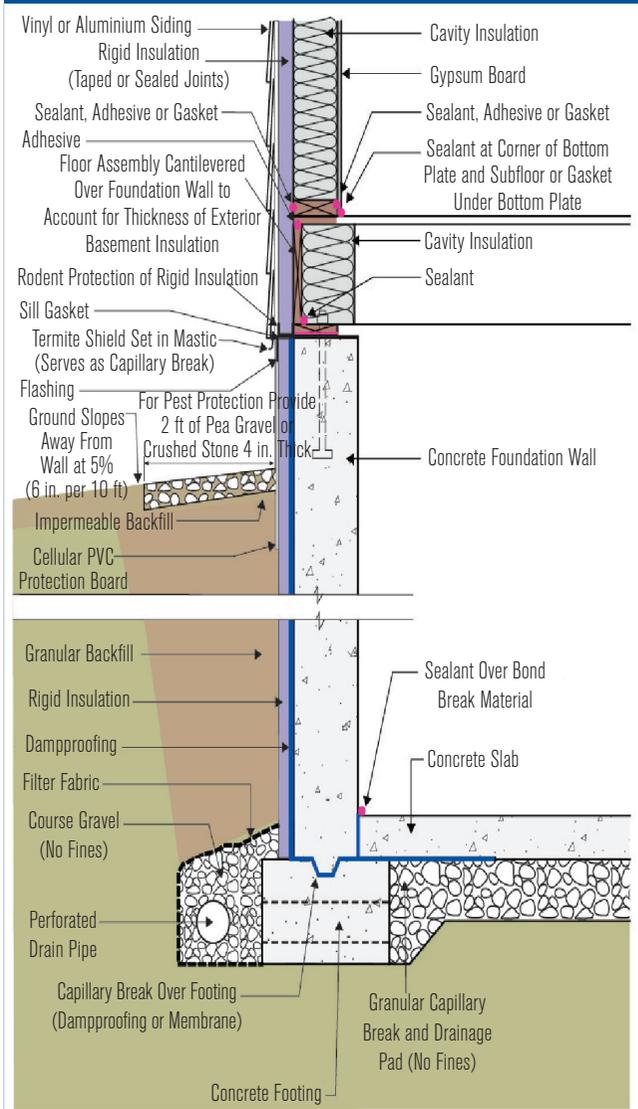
illustrates a basement foundation insulated on the exterior. Exterior basement foundation insulation can act as a pathway for termite entry. The use of stainless steel termite shields set in mastic and sealed to the top of the foundation wall addresses this pathway. The joints in the termite shield need to be overlapped and sealed. The termite shield needs to extend outward past the exterior edge of the exterior basement foundation insulation and its associated protection layer a minimum of ¼ in. (19 mm) to impede the ability of termites to bridge the shield. This also facilitates visual inspection of the effectiveness of the termite shield.
